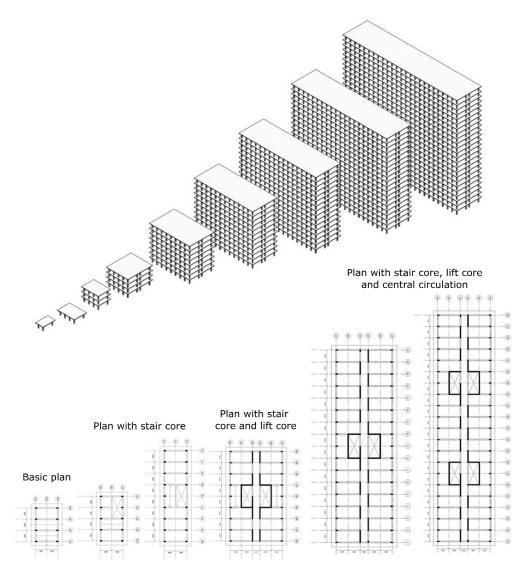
Examples of the proposed structural layout and its variations in plan and volume.
